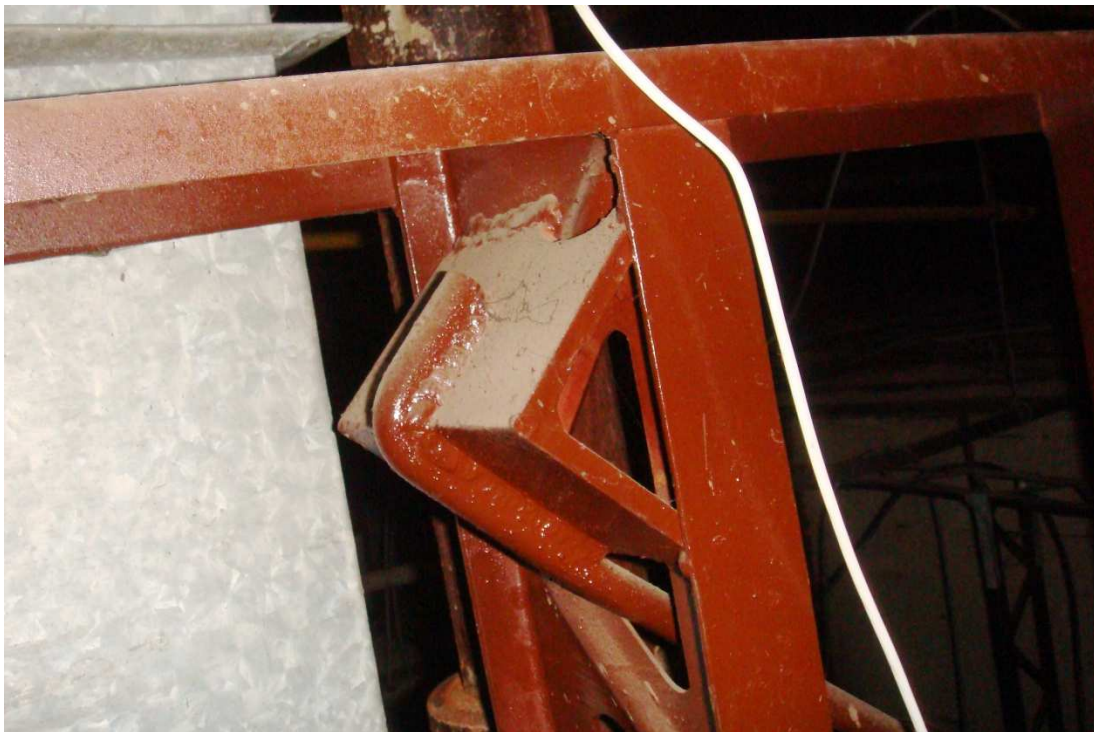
Interior Braced Wall Panel End Connection above Ceiling (note eccentricity and tack weld connections)
